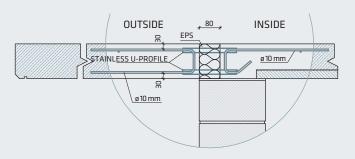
Cantilevered balcony slab with TKM G-E rib
